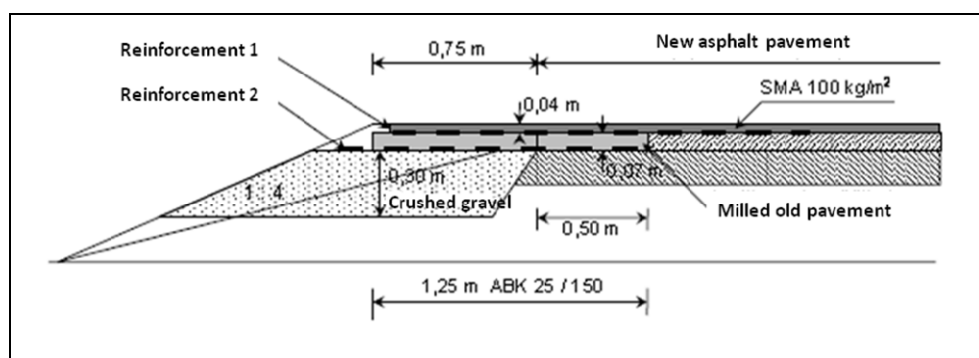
Highway 4 Test structure [Alkio, Pihlajamäki, 2001]
